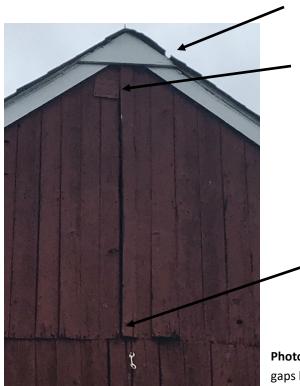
View of the peak of the west gable end showing gaps between boards, lifting of boards, and a license plate used as a patch. Also note the gap at the asphalt roofing.
